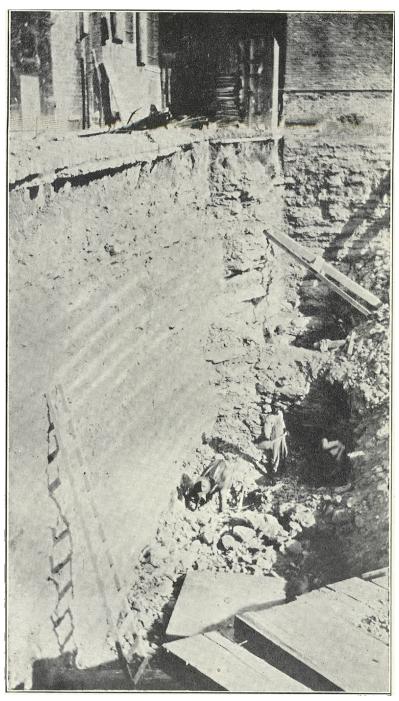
Fort Worth limestone, in excavation at northwest corner of 8th and Houston sts., Fort Worth. Excavations for buildings in the main business district pass into or entirely through the Fort Worth limestone.
